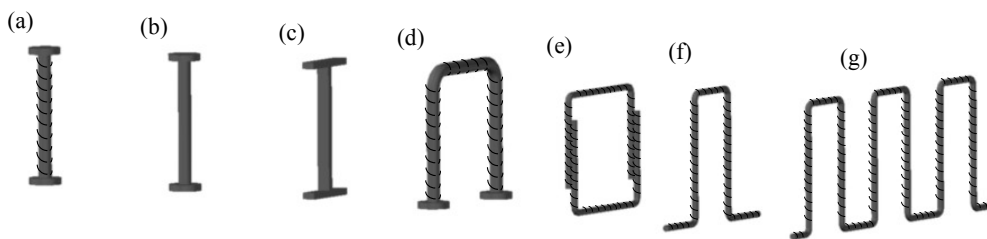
Examples of shear reinforcement systems: (a) corrugated double headed shear studs, (b) smooth double headed shear studs, (c) steel offcuts, (d) headed stirrups, (e) stirrups with lap at the vertical branch, (f) stirrups or shear links, (g) continuous stirrups or cages of shear links
